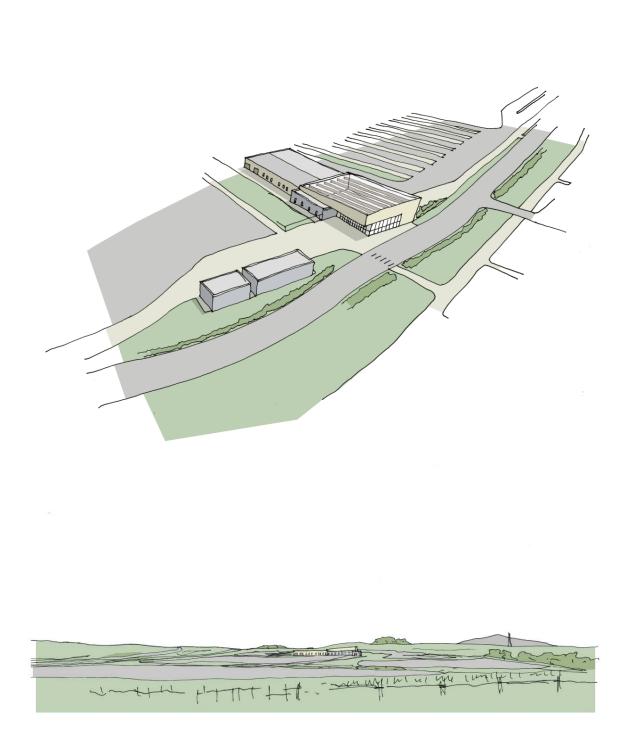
Preferred Architectural Design of Dalar Hir Park and Ride Facility
